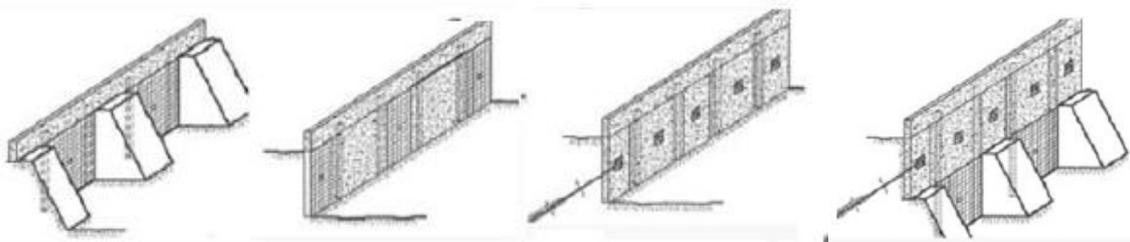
Munich walls construction sequence (Pinto A., 2010, *Retaining walls and structures. Discipline of Excavations and Underground Works. Instituto Superior Técnico*)
